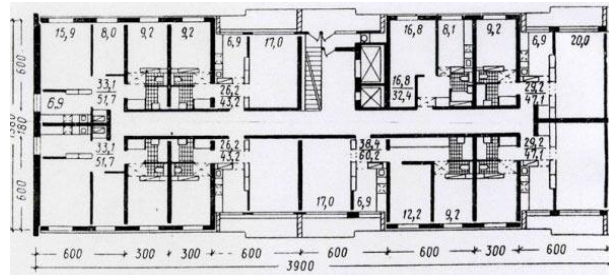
Typical floor plan of Khrushchovka series 1-60
